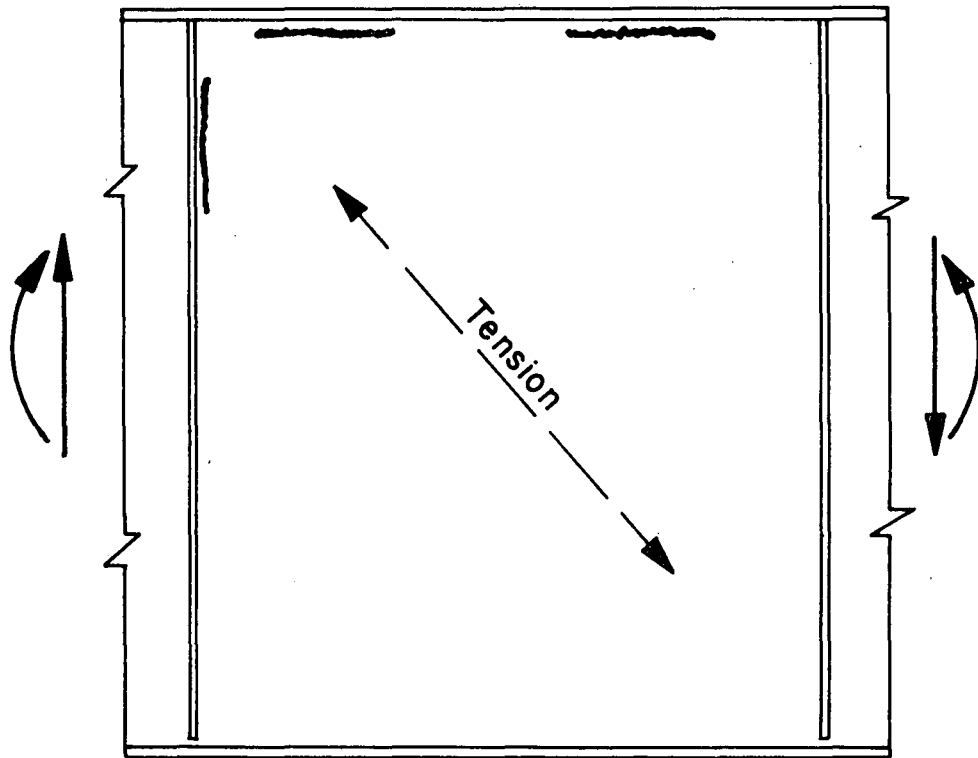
Locations of Web Cracks, Panel Under Combined Bending and Shear
